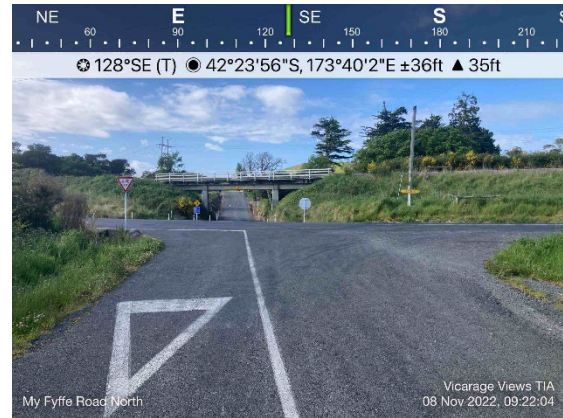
Ludstone Road/Mt Fyffe Road intersection (north)
